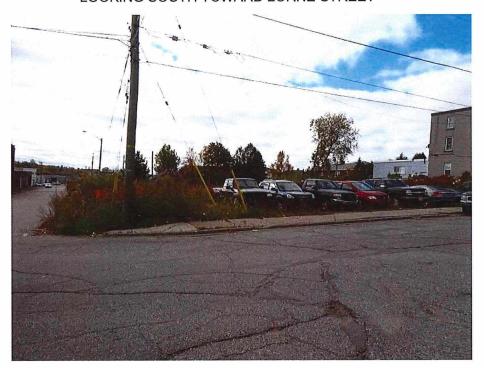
PROPOSED LOCATION FOR ACCESSORY PARKING GARAGE AS VIEWED FROM VICTORIA STREET LOOKING SOUTH
